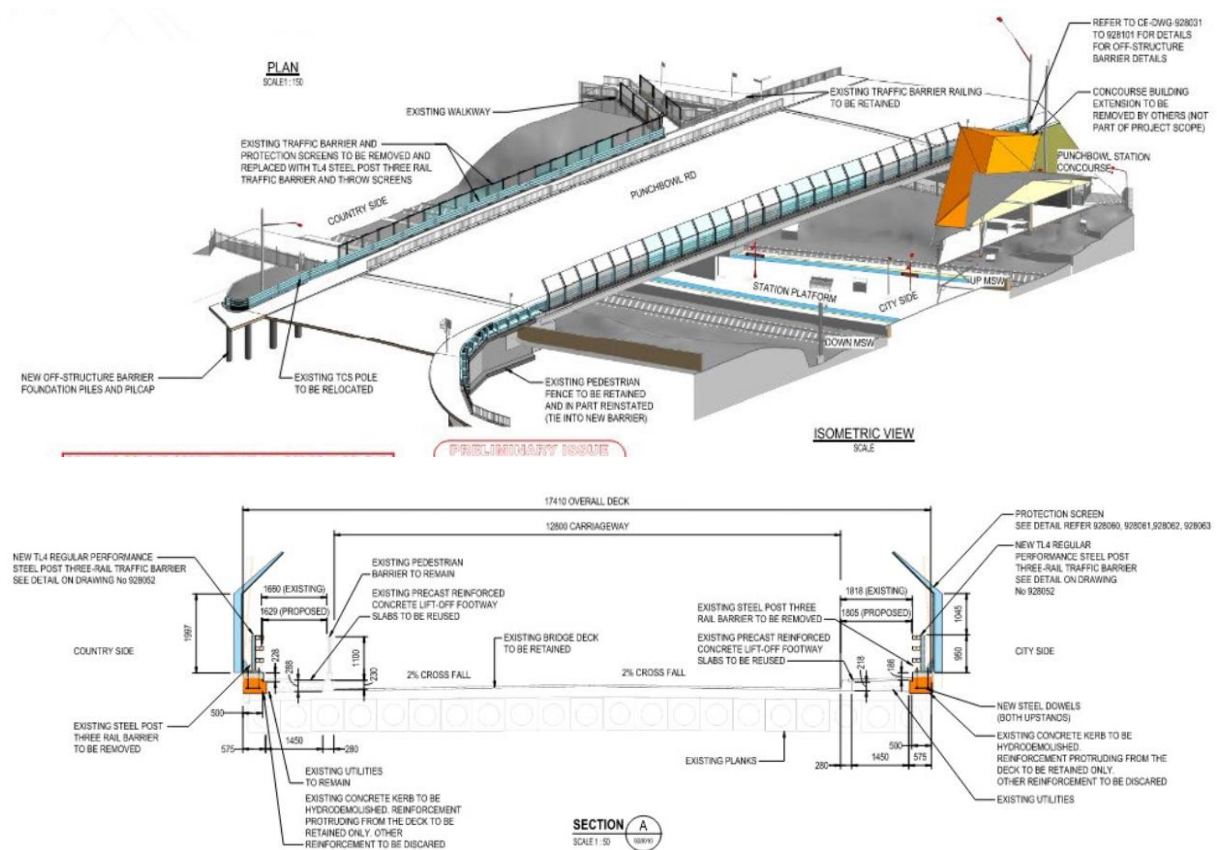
Plan of treatment works for Punchbowl Road Bridge (Source: Aurecon 2024, provided by ARCH Artifex)
